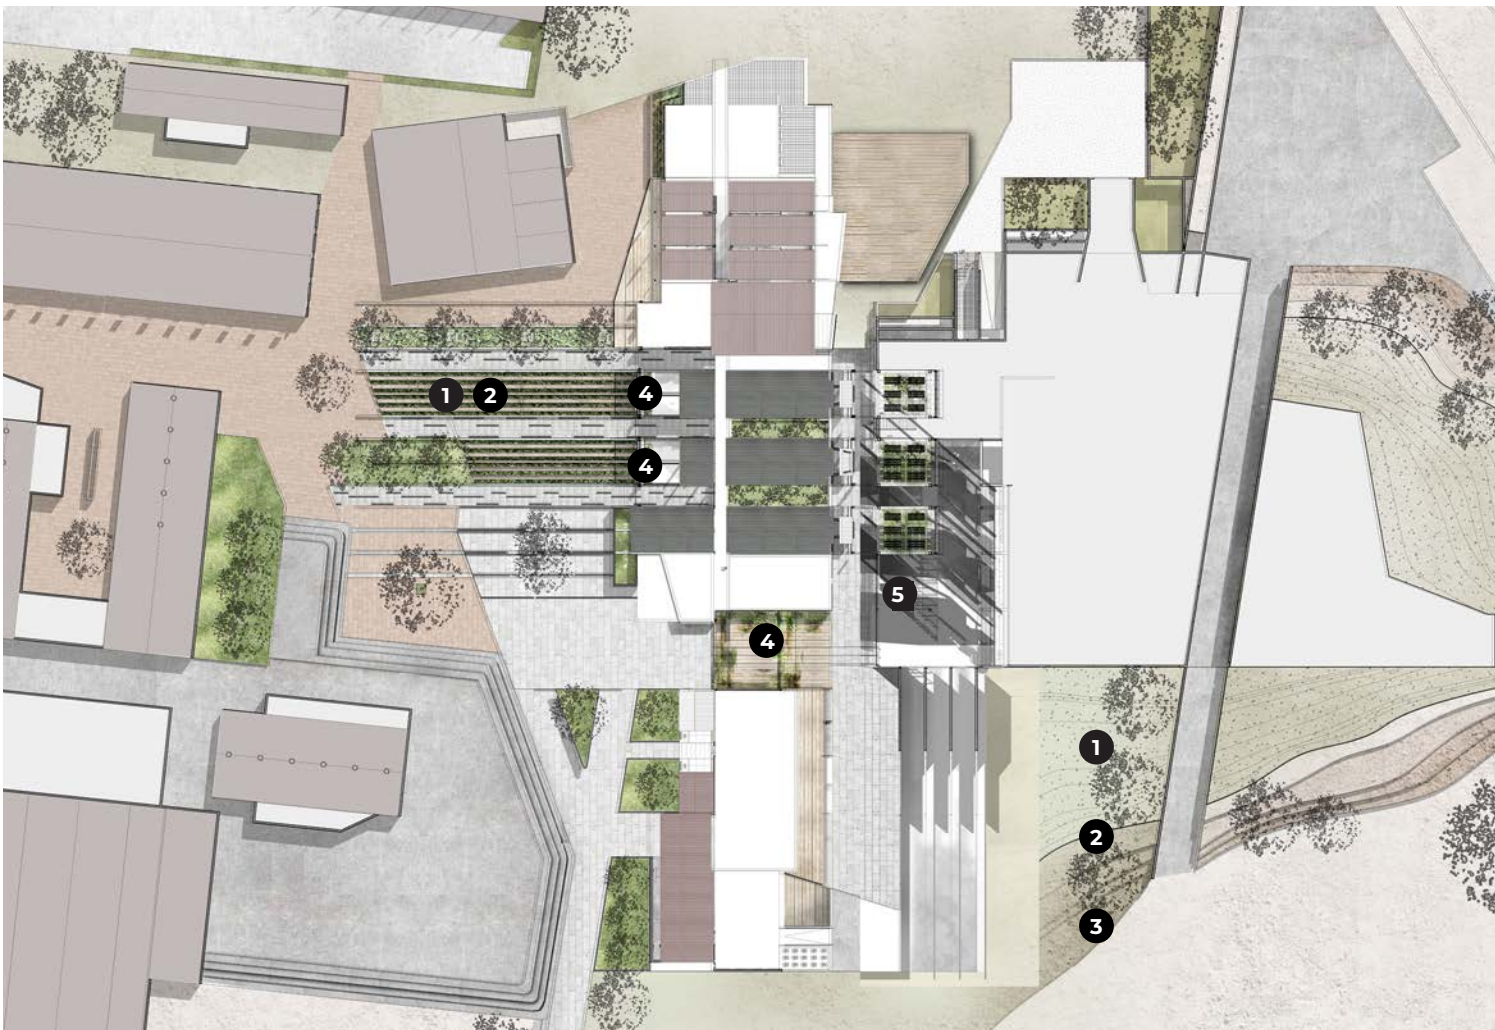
Planting plan Scale 1:1000 (Author:2018)
